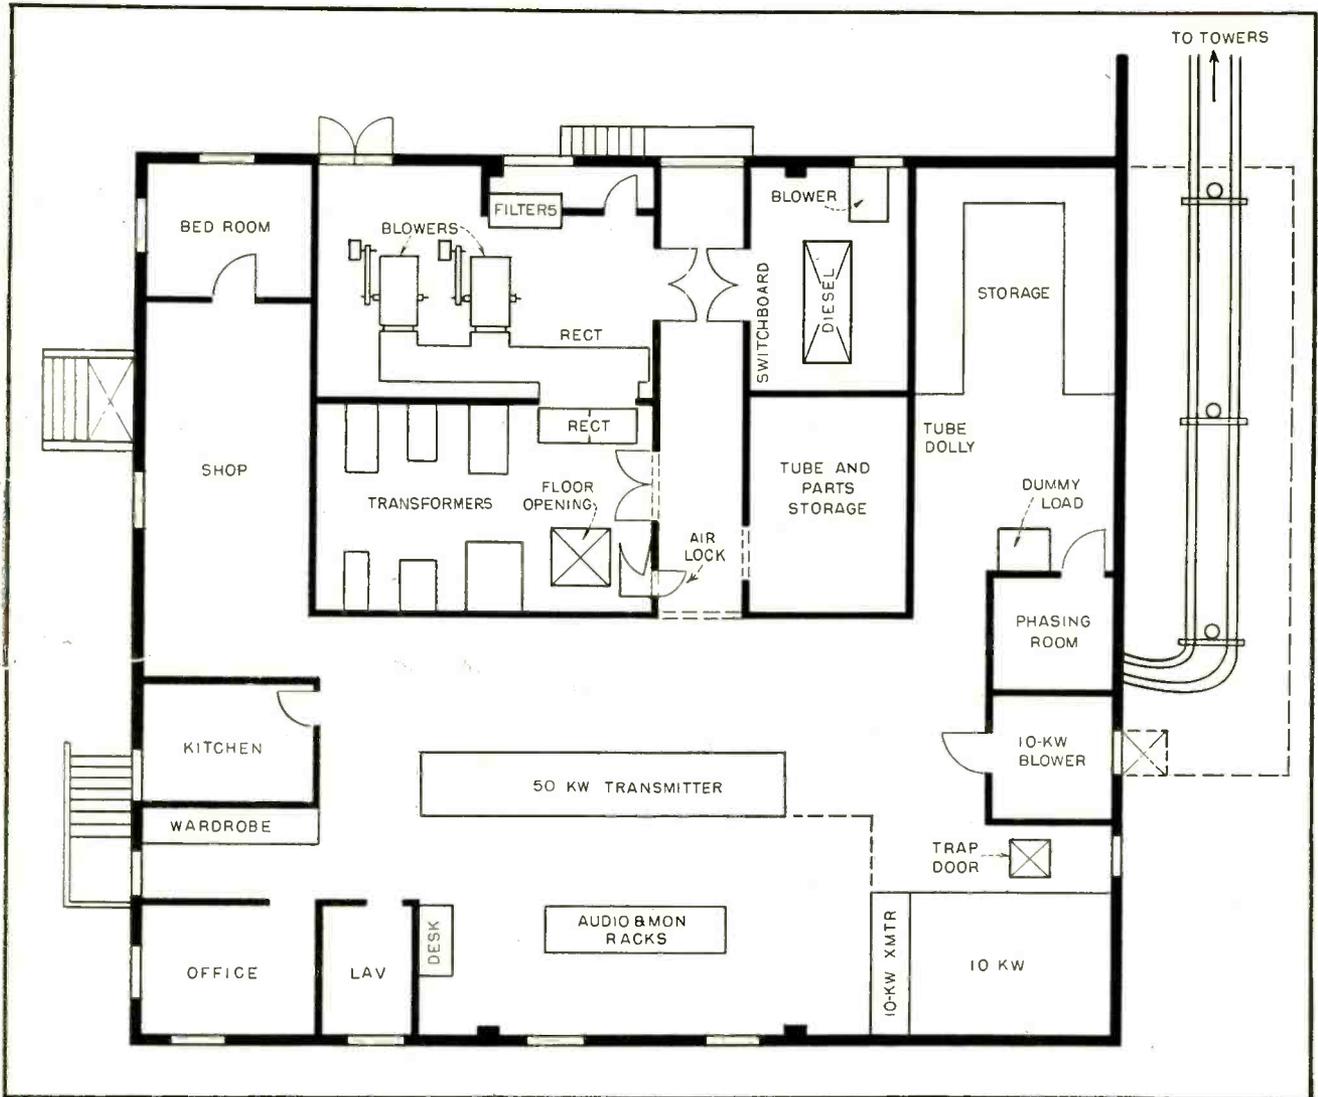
Floor plan of WNEW transmitter plant in Kearny, N. J.
